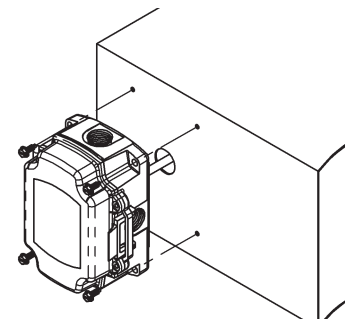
BAPI-Box (BB) Enclosure Mounting and installation Holes (Rotate 90° for Horizontal Mounting)
